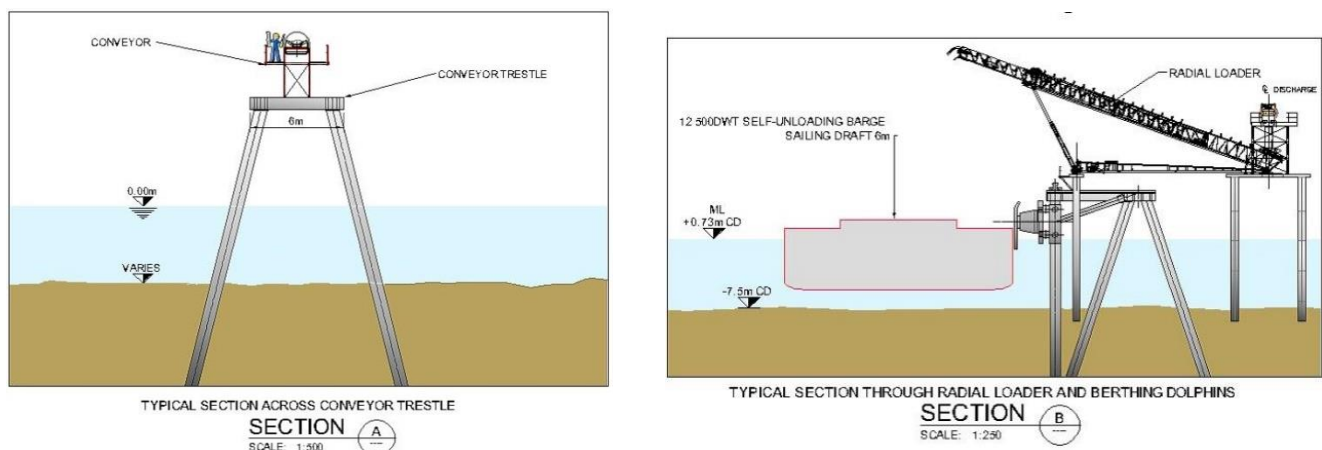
| Cross section of an ‘A’ frame wharf and ship loading equipment
